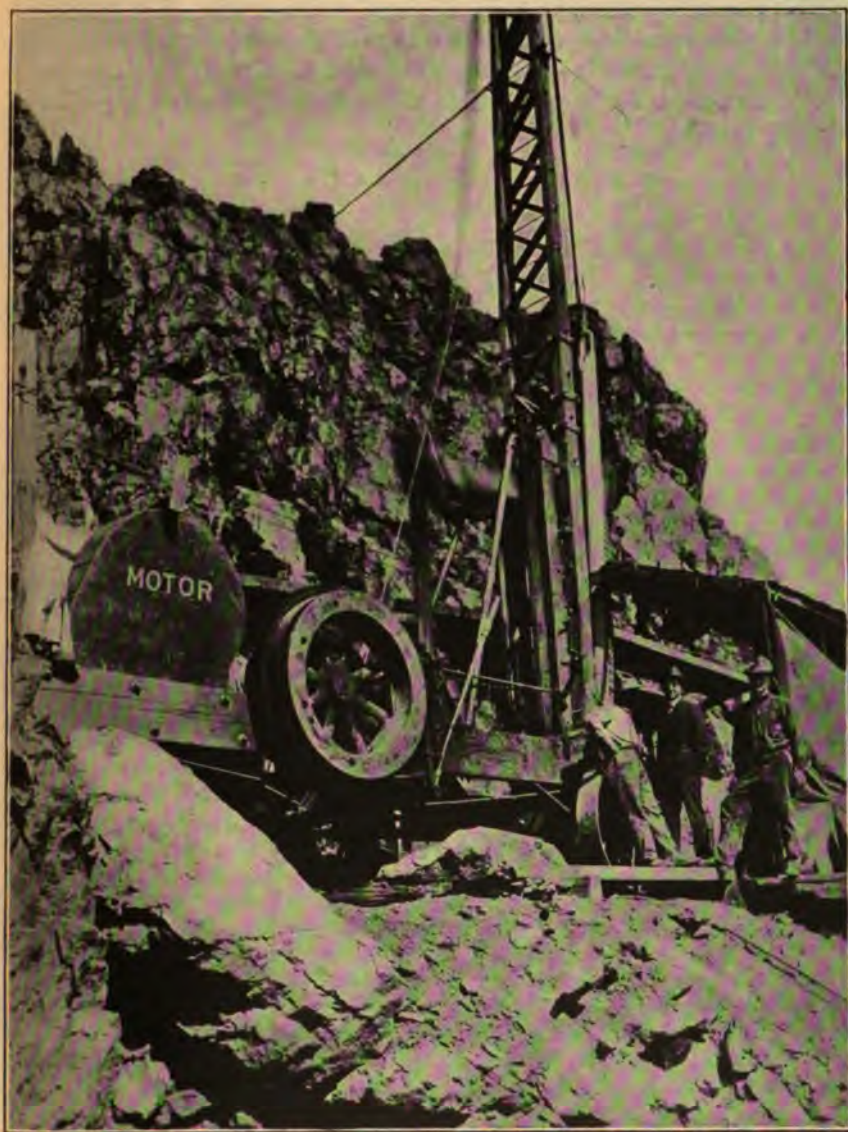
SIDE VIEW OF ONE OF THE ELECTRIC DRILLS IN OPERATION.
